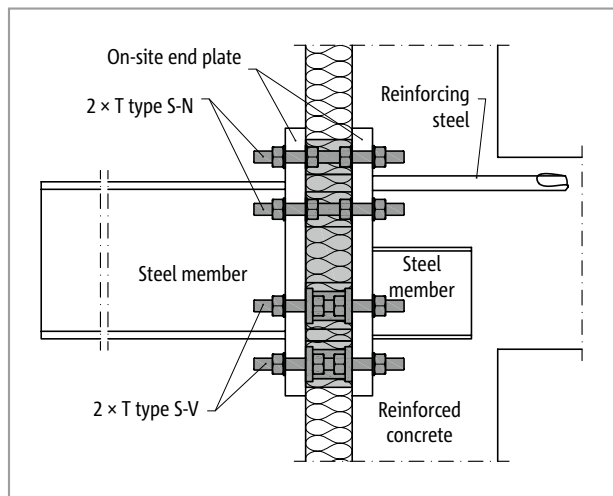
Schöck Isokorb® T type S-N and T type S-V modules for connection of steel structure to reinforced concrete frame
